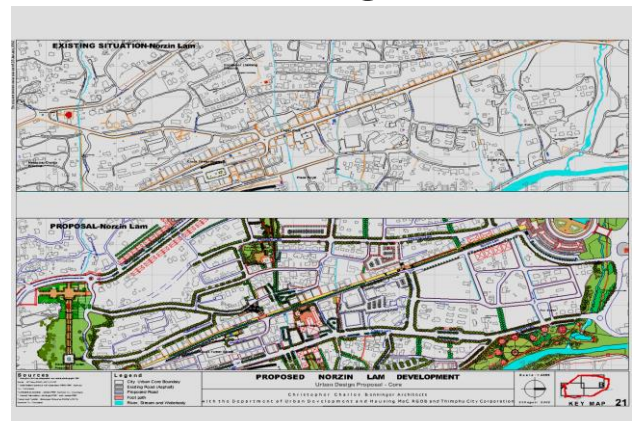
Proposed Norzin lam Pedestrian with conservation of traditional architectural features.
